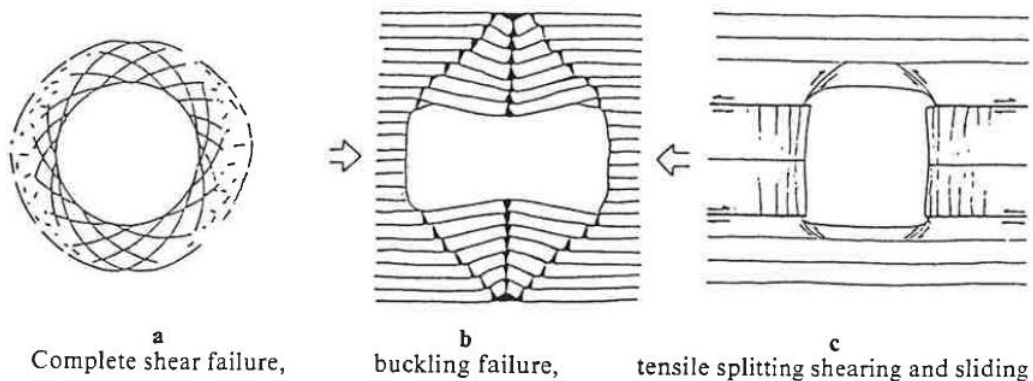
Main failure modes in overstressed ground in tunnels (Aydan et al. 1993)
